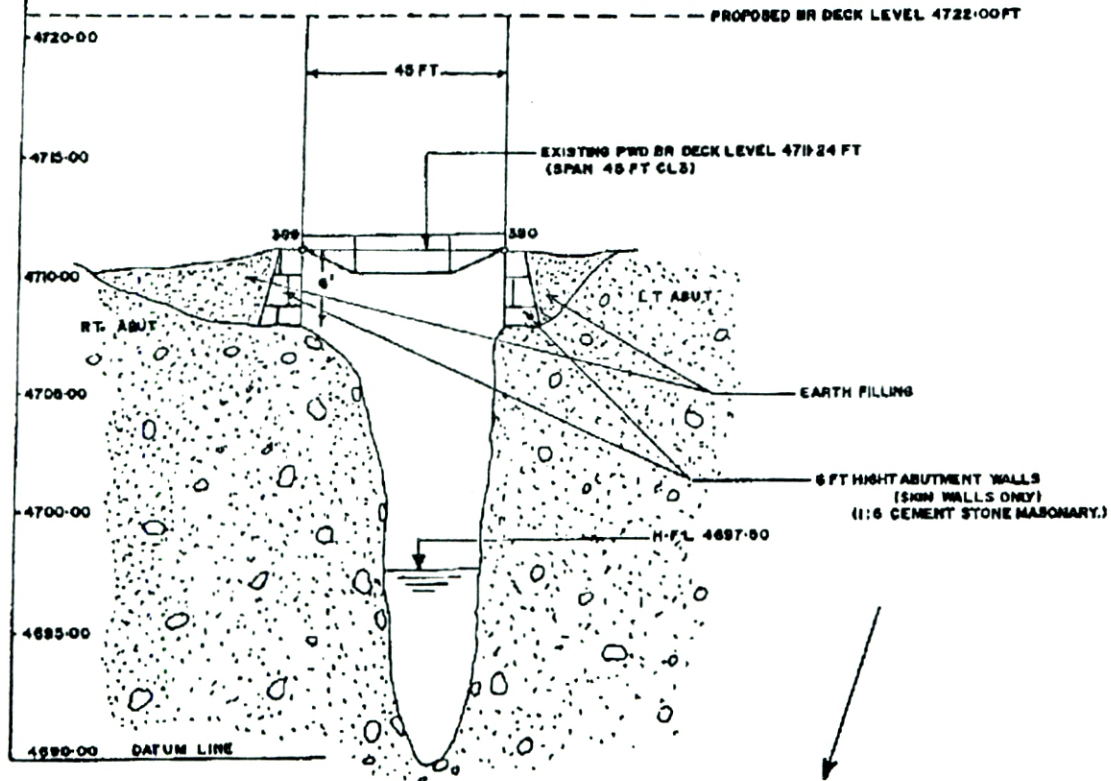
Geologic cross section at the proposed Barumdoir Nullah bridge.
